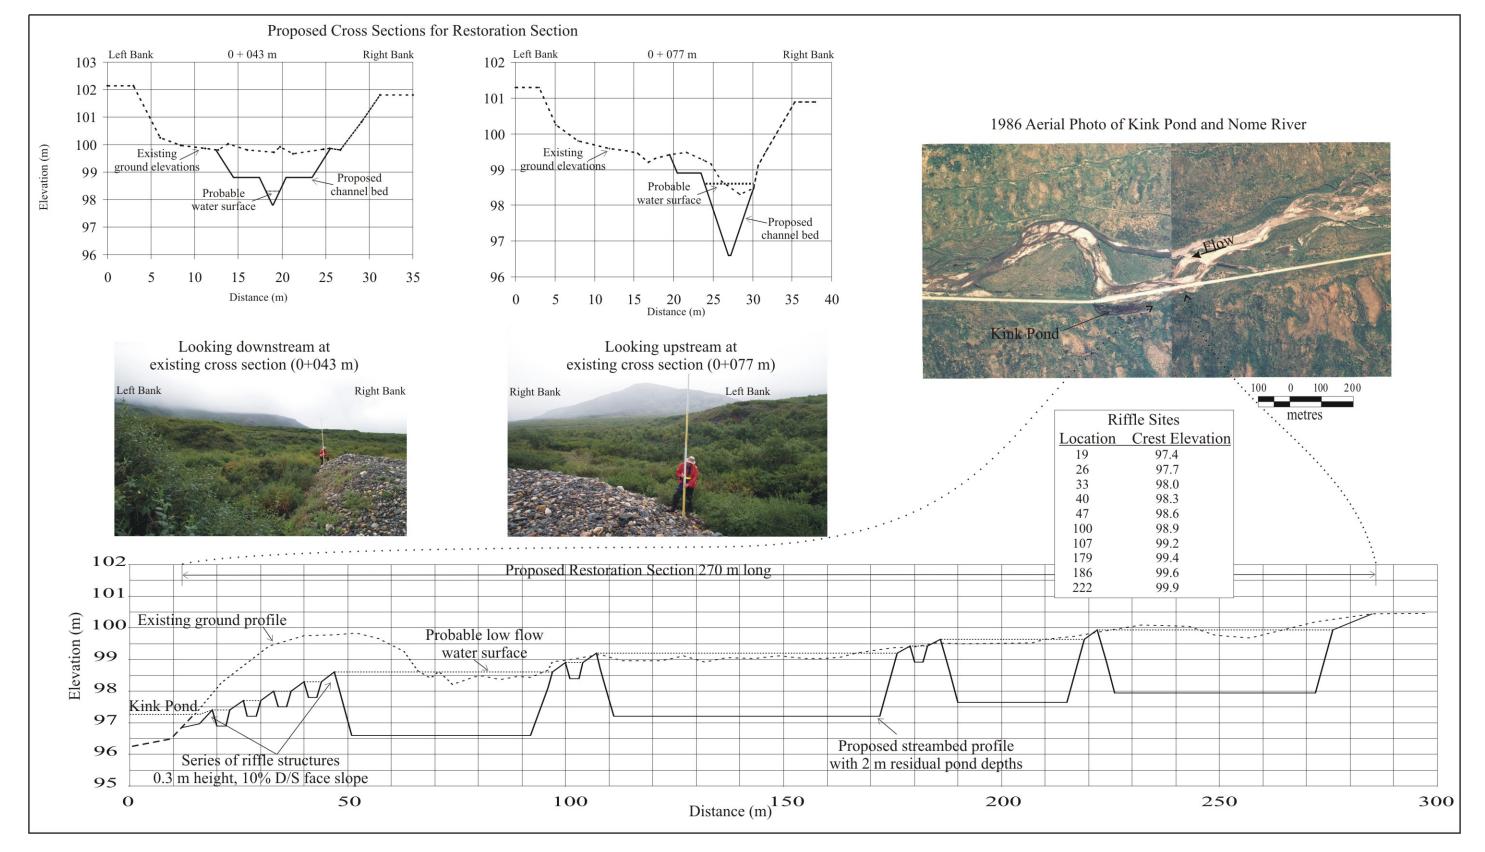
Aerial photo view and proposed groundwater channel cross sections and profile upstream of Kink Pond.
